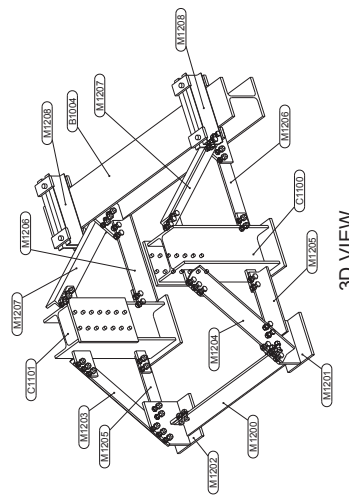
Fabrication Drawing, Girder Reaction Frame, Tension Brackets
